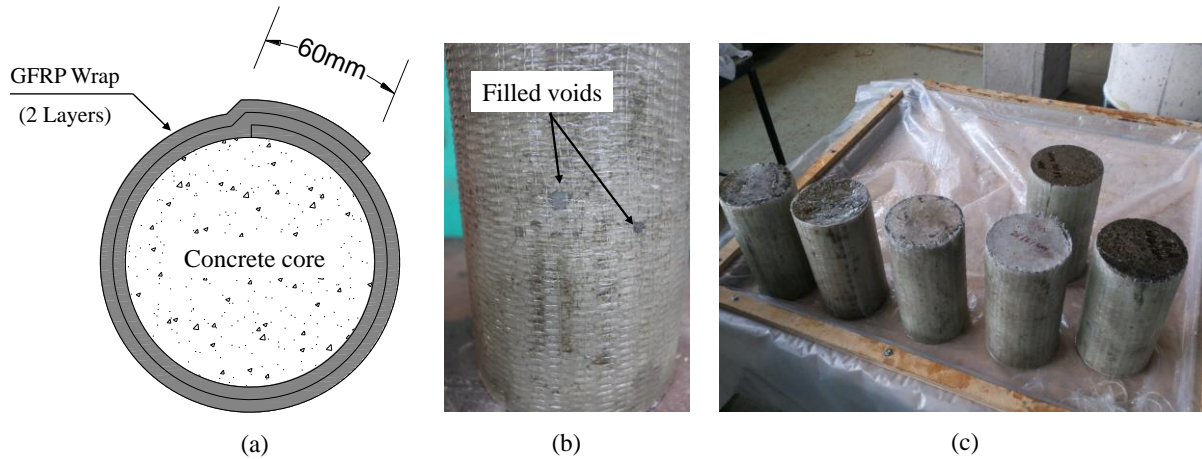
Preparation of GFRP-confined concrete cylinders (a) Overlapping layout (b) Filling voids (c) Wrapped specimens
